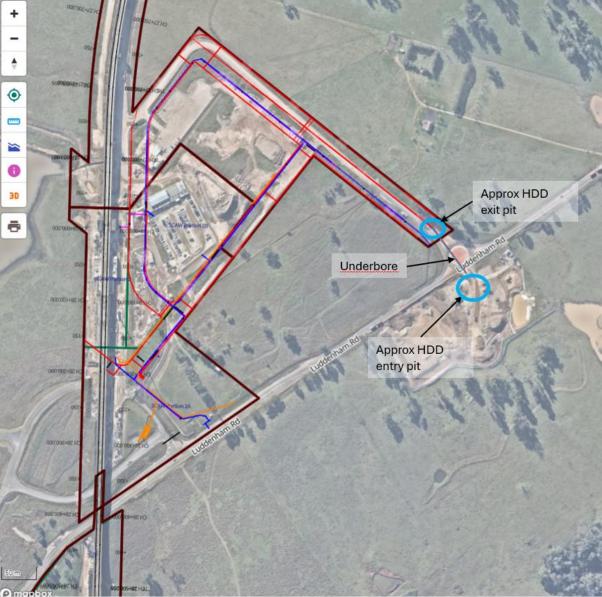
Location of proposed utility works. Red and black linework construction footprint handed over for SSTOM works.
